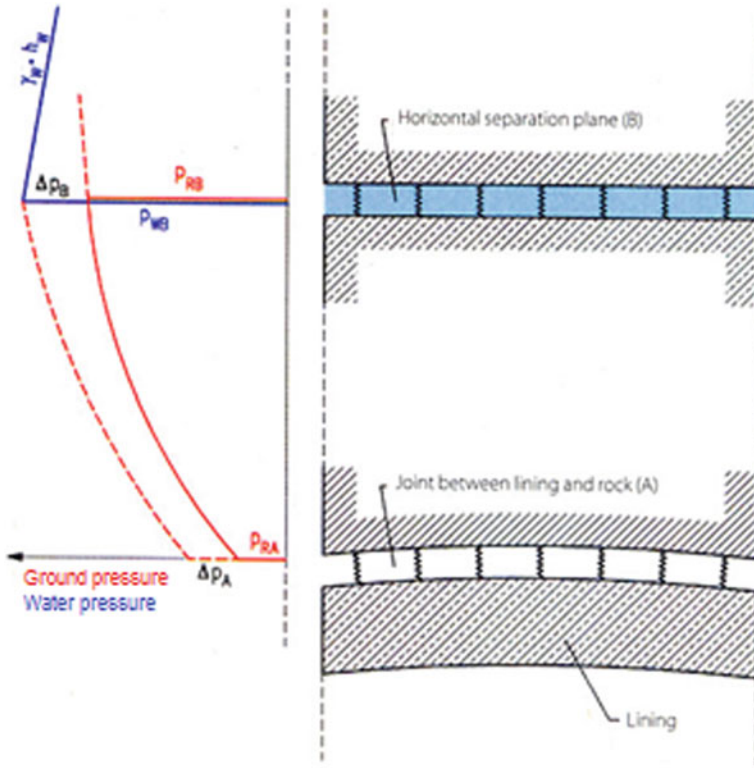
Water permeable horizontal separation plane in the roof zone and water tight joint between lining joint between lining and rock
